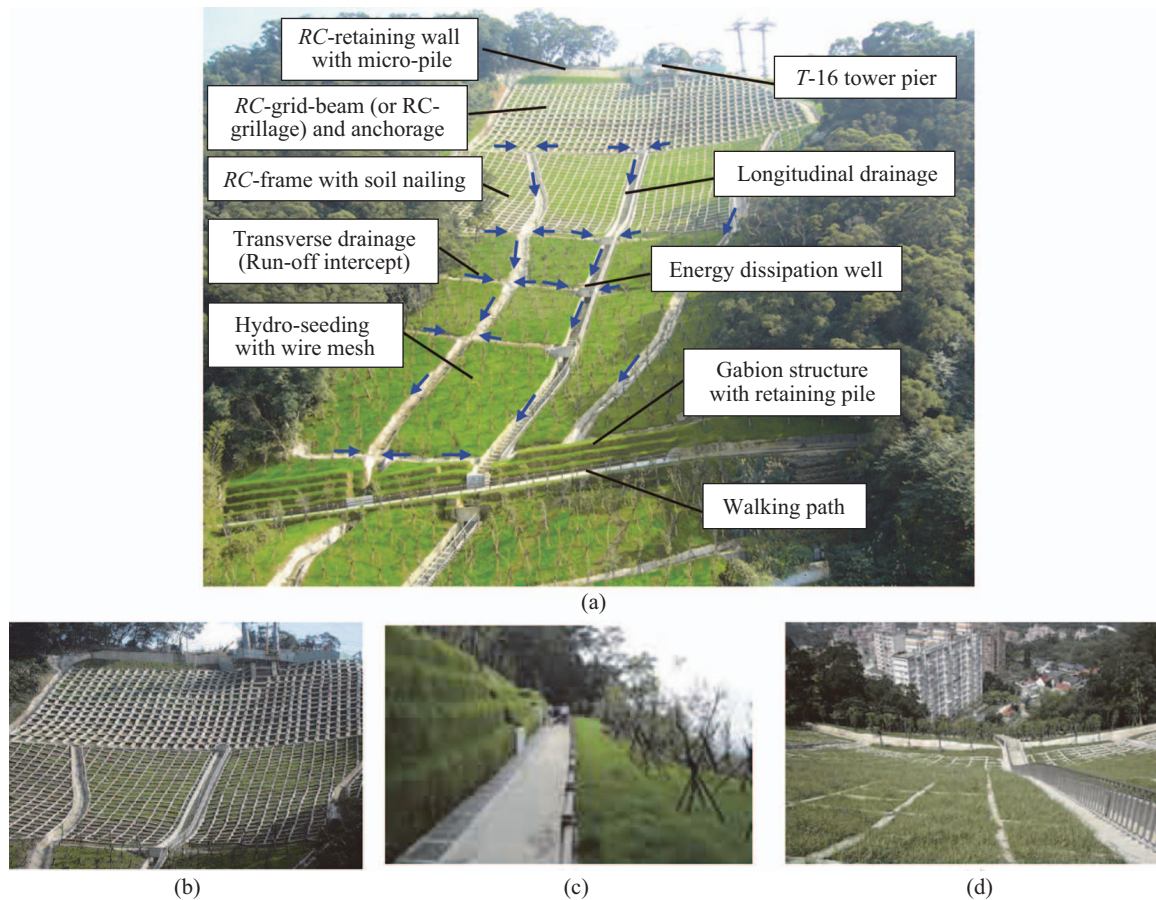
(a) Overall configuration of remediation in T16-Slope (b) RC-grid-beam (or RC-grillage) and anchorage at up-middle-slope and RC-frame with soil nailing at middle-slope (c) Gabion structure and walking path with retaining piles at down-slope (d) A bird's-eye view from RC-frame with soil nailing and hydro-seeding at middle-slope.
